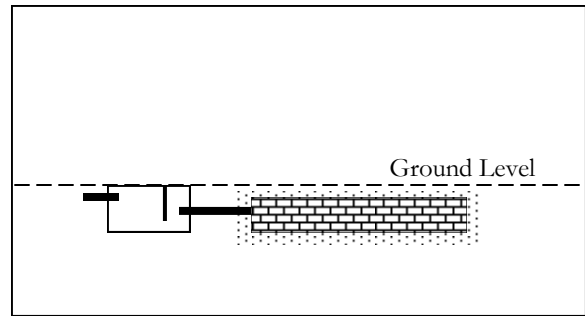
B. (Side View) Septic Tank and Brick-Trench System. Slotted openings in walls and long bottom of each side allow for appropriate lateral absorption. Brick-Trench systems require a stable gravel base and footing for construction to ensure structural integrity. Depending on materials and soil conditions waterproofing of concrete materials may be necessary to protect mortar and joints.
